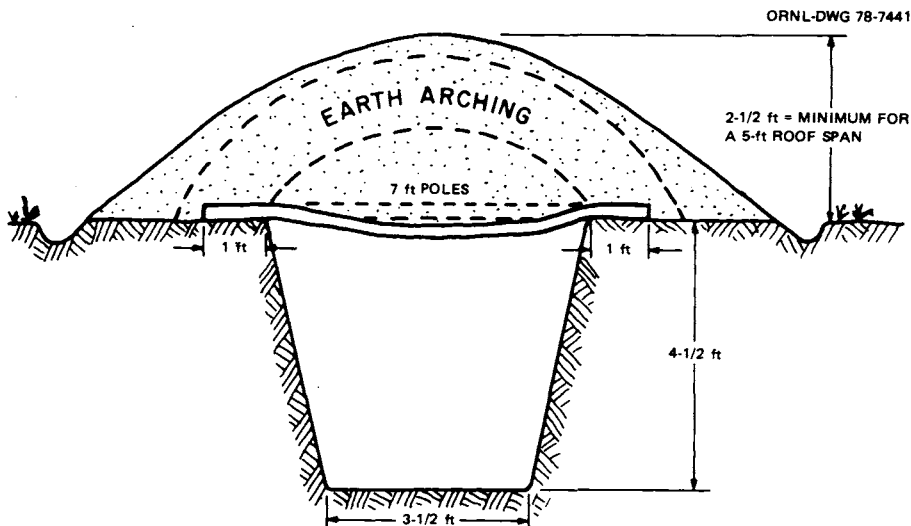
Earth arching over a yielding roof enables a shelter to withstand much greater pressures.
